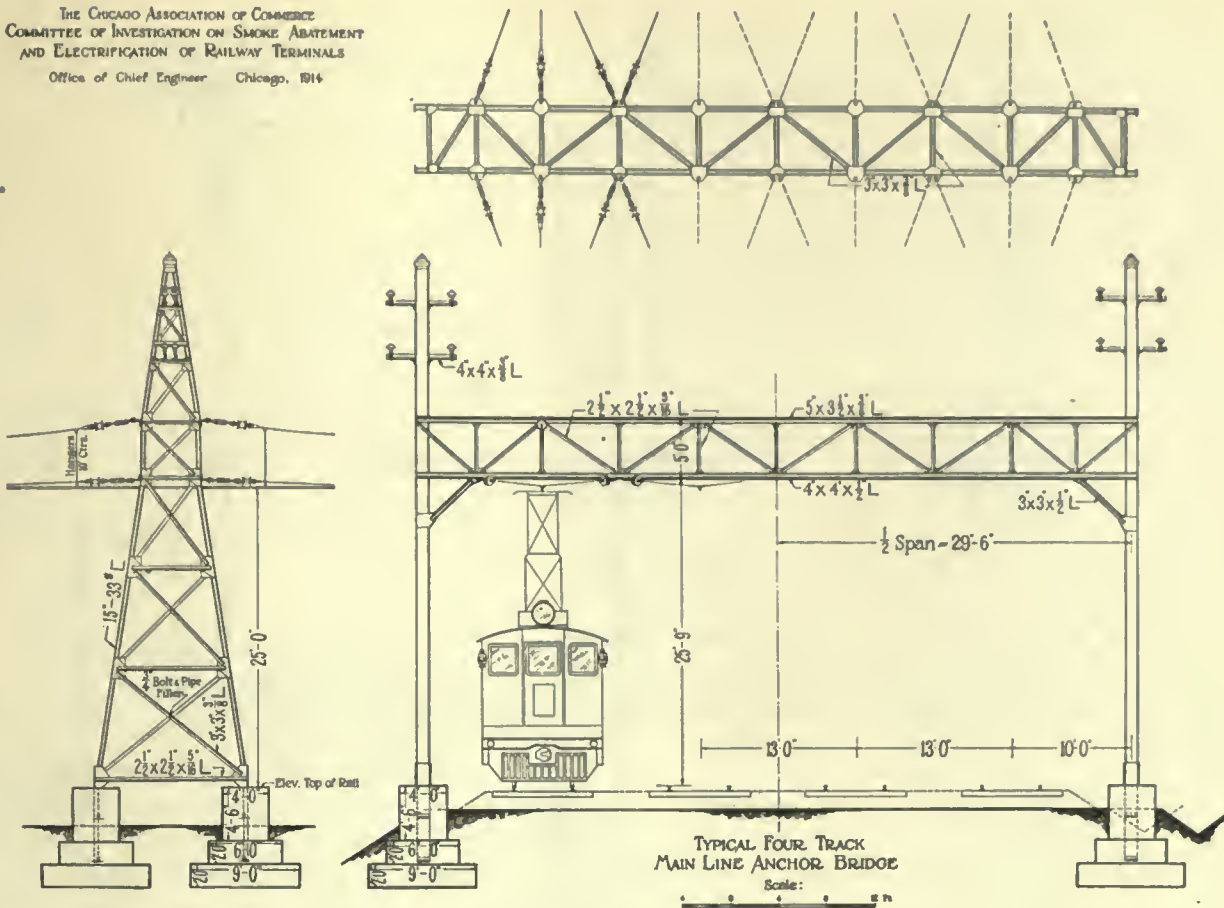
TYPICAL FOUR TRACK ANCHOR BRIDGE
